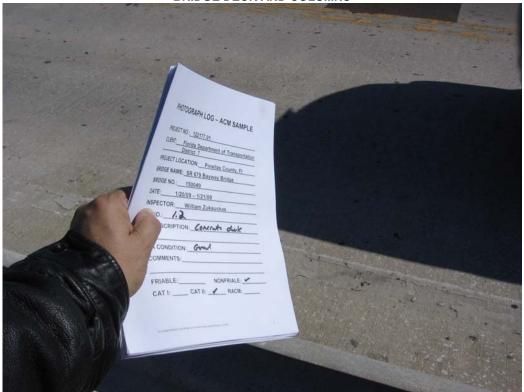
01/21/09 – SAMPLE 1.2 – HA 1 CONCRETE BRIDGE DECK AND COLUMNS
